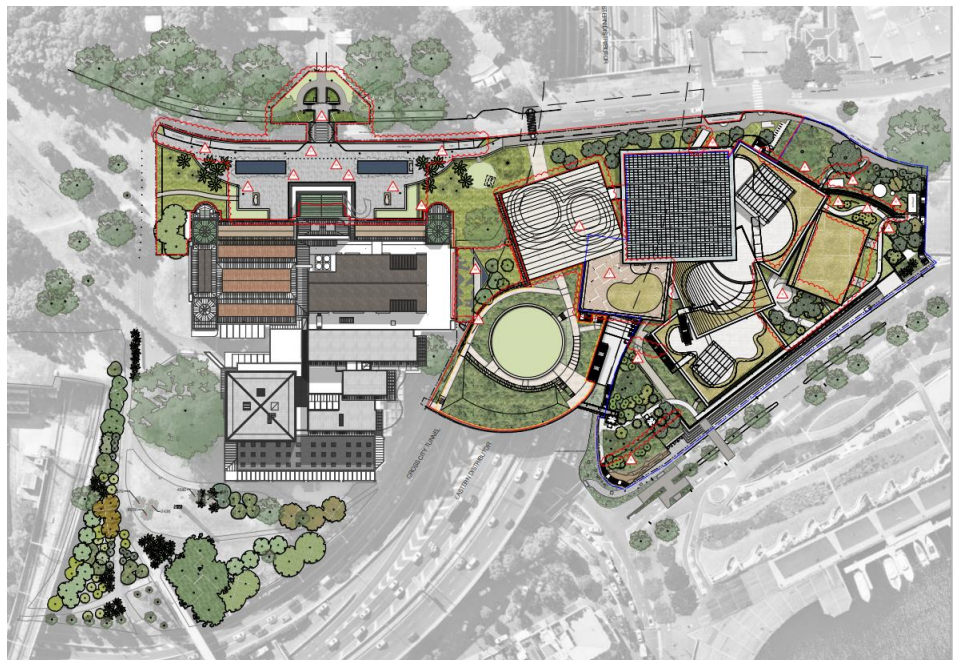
Proposed Landscape Masterplan – Drawing no. LD_DA_00-01 – Modification 8
